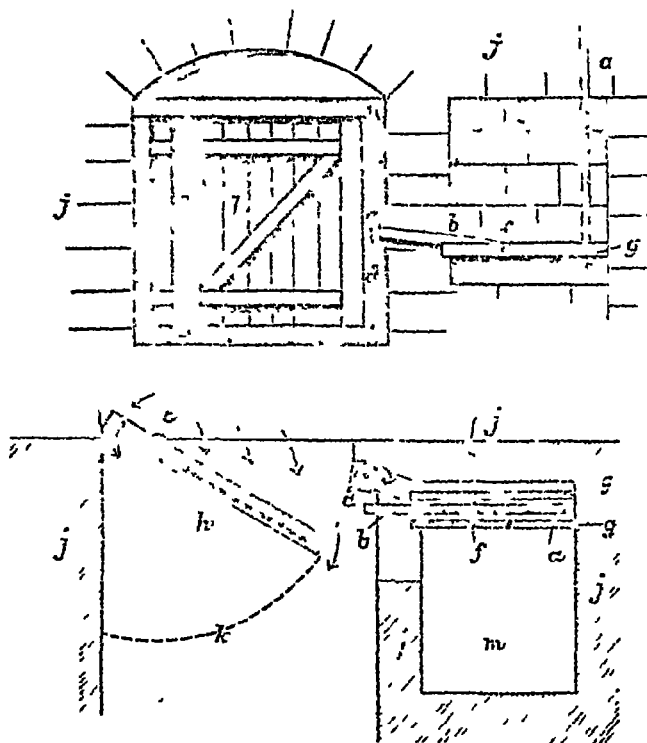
is an elevation of the sluice door of the Klorinsky dam, Sulzhammergut District, Austria, by opening which the imprisoned water is allowed to escape when required. *a* is the long pole (only a portion of it is seen) by means of which one end of the lever *b* is depressed so as to free the post *d*, which keeps the door shut; a stud *c* projects from the post and the lever *b* pressing against this stud keeps the post *d* in position and the door shut. *f* is the pivot round which the lever is free to move; *g g* is the frame to which the pivot is fixed; *h* is the door of the sluice; *e* is the pivot on which the door turns; *j* is part of the masonry of the dam; *k* (fig. 131) is the passage through which the water rushes when the sluice gate is open; *m* is an opening leading from the sluice gate to the top of the dam. It is made in the thickness of the dam and is furnished with steps so as to allow of the sluice gate being inspected if necessary. (After Mr. G. R. Forster.)
